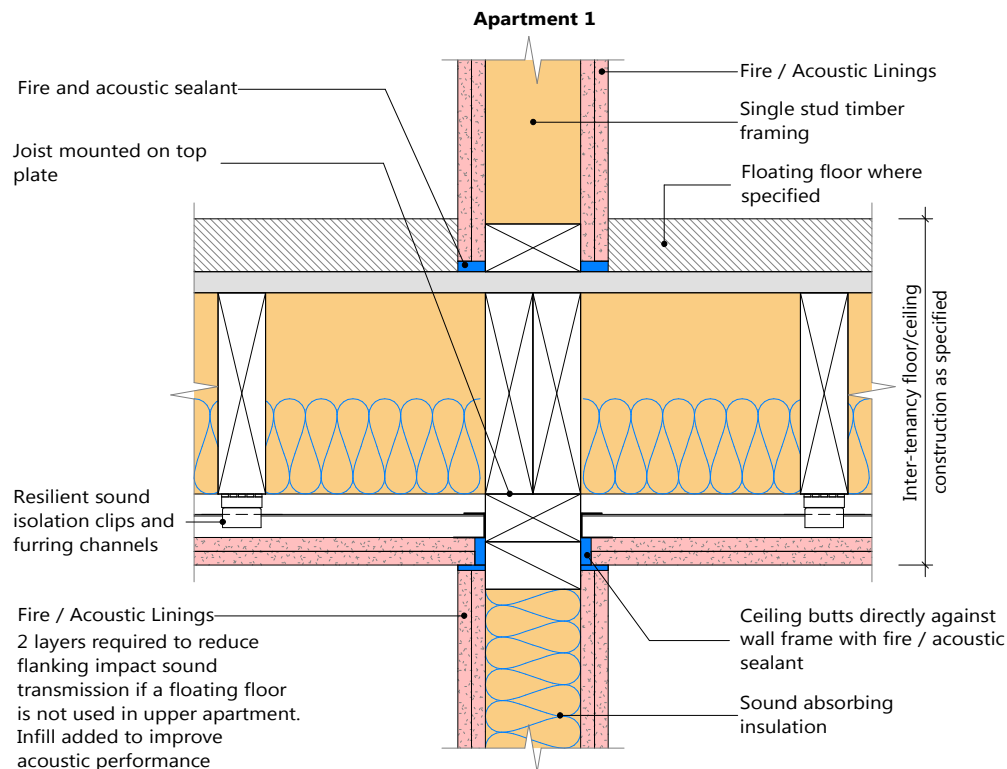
Internal load bearing wall top plate attached directly to joists. Joists running parallel to wall.
